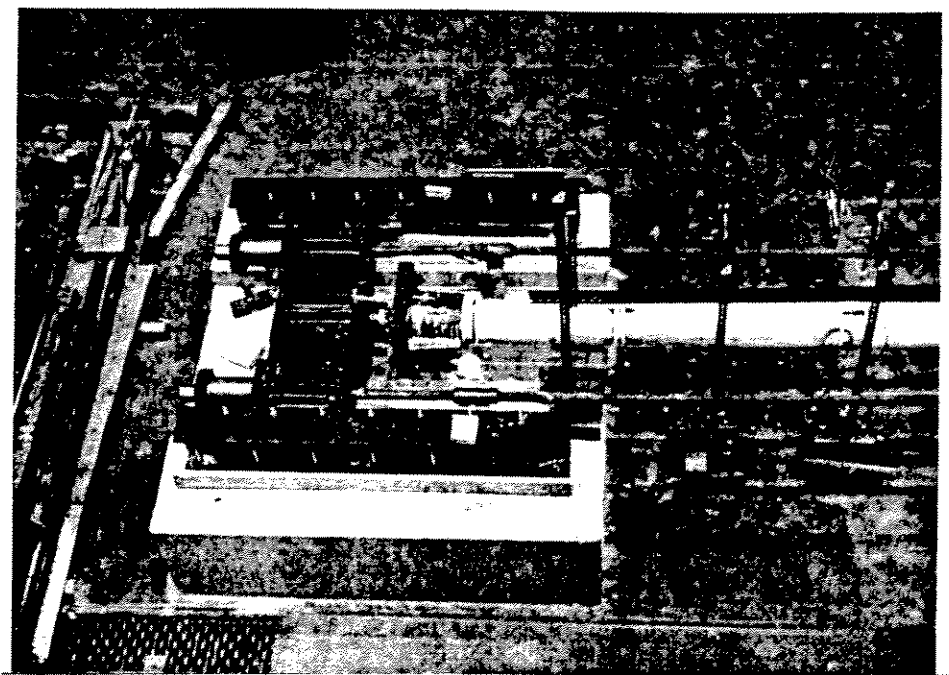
Sliding Load Beam and Reinforced Concrete Guide Block
